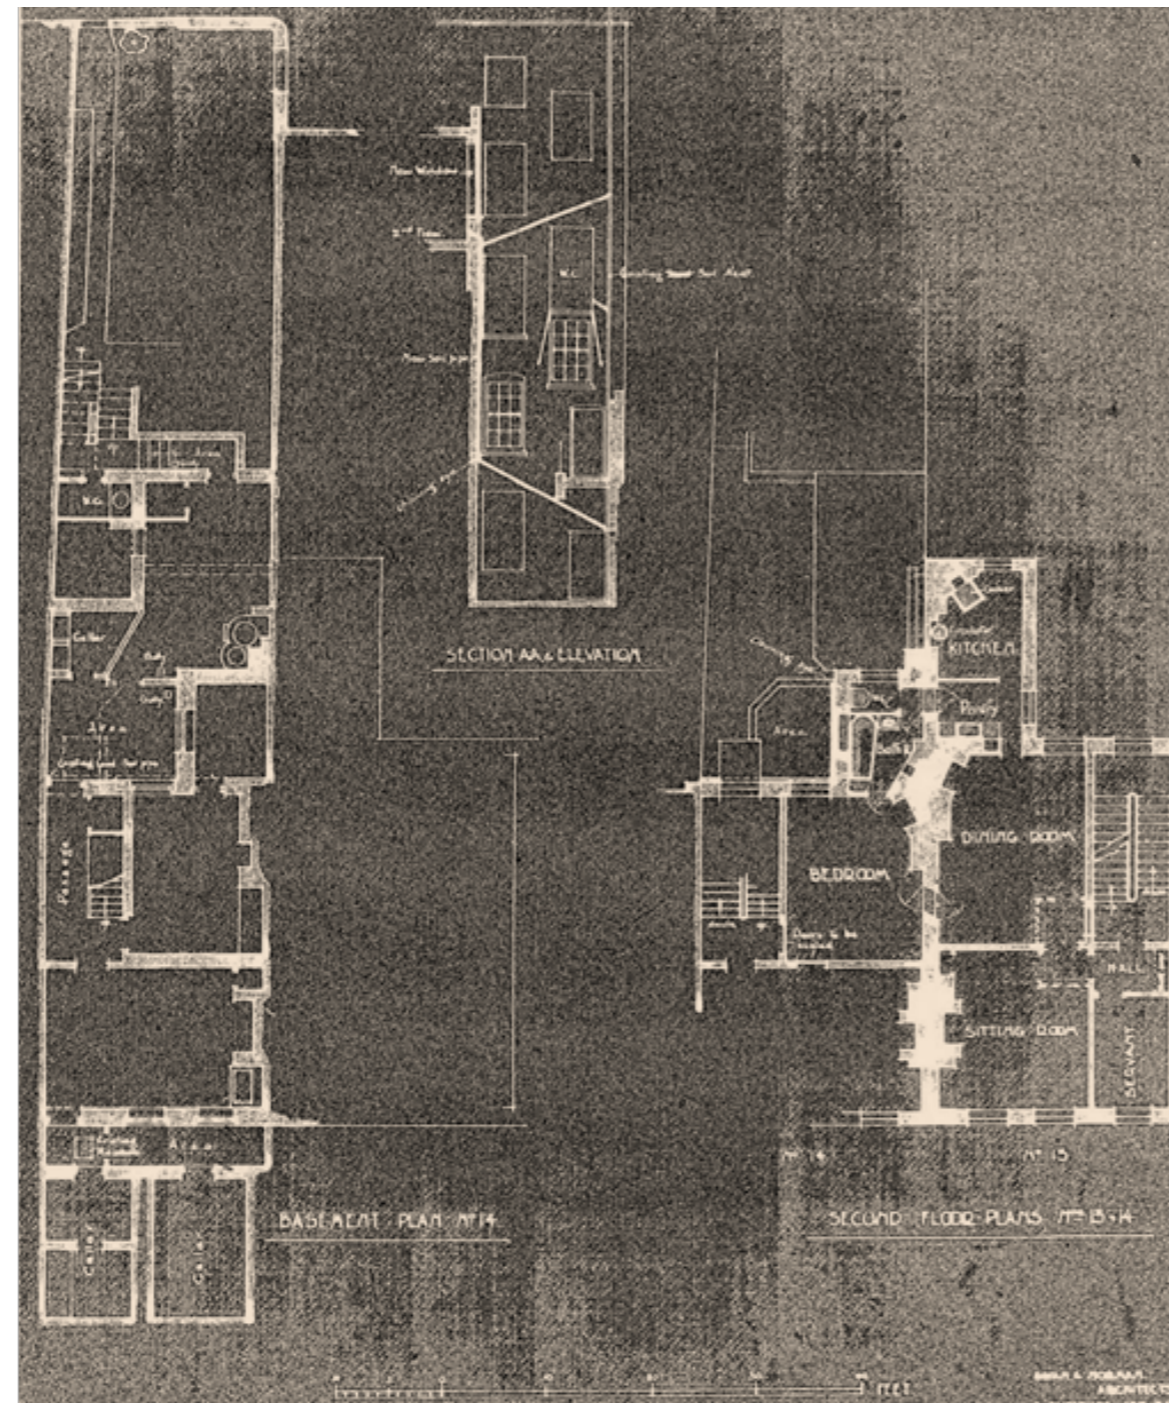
APRIL 1923 SWANN AND NORMAN ARCHITECTS PLAN ASSOCIATED WITH PROPOSED WORK AT NOS. 13 AND 14 GREAT JAMES STREET, BASEMENT, SECOND FLOOR PLANS, SECTION AA AND ELEVATION (SOURCE: CAMDEN LOCAL HISTORY LIBRARY AND ARCHIVE).
